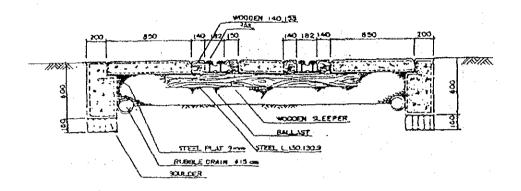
Preiminary Design Drawings of Civil Structure for Plan-2 (Reach Stacker)
